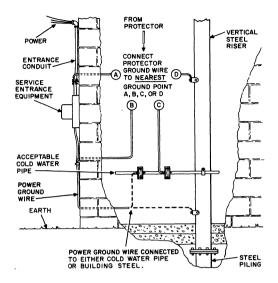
Acceptable Water System or Building Ground—Power Service Grounded to Cold Water Pipe or Building Steel
